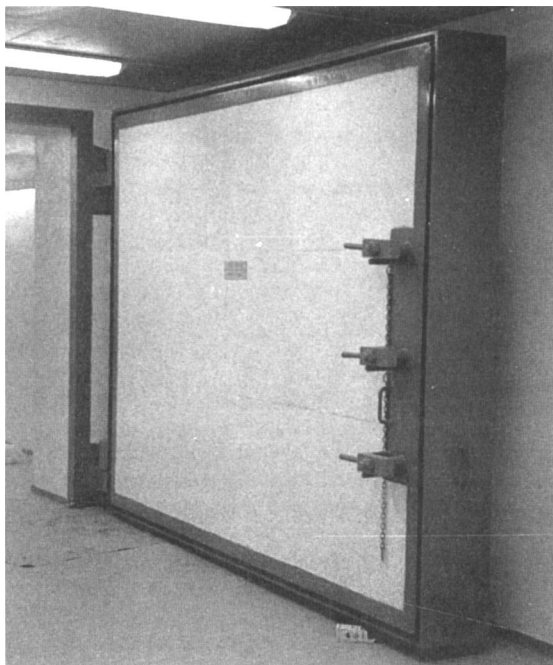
Blast doors at Holmlia, Norway, civil defense and sports facility (photograph: D. Piepenburg).
